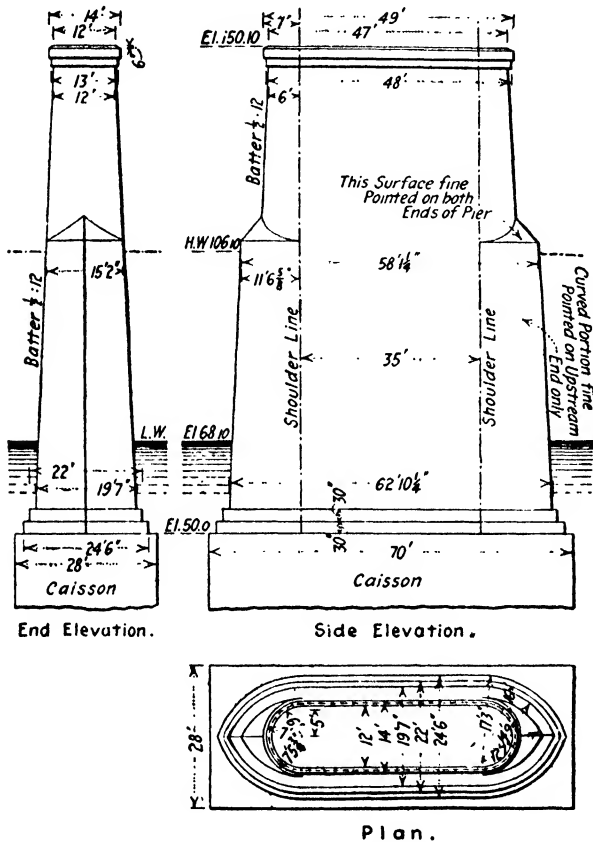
f*.—General Dimensions of Pier 3 of the McKinley Bridge.
